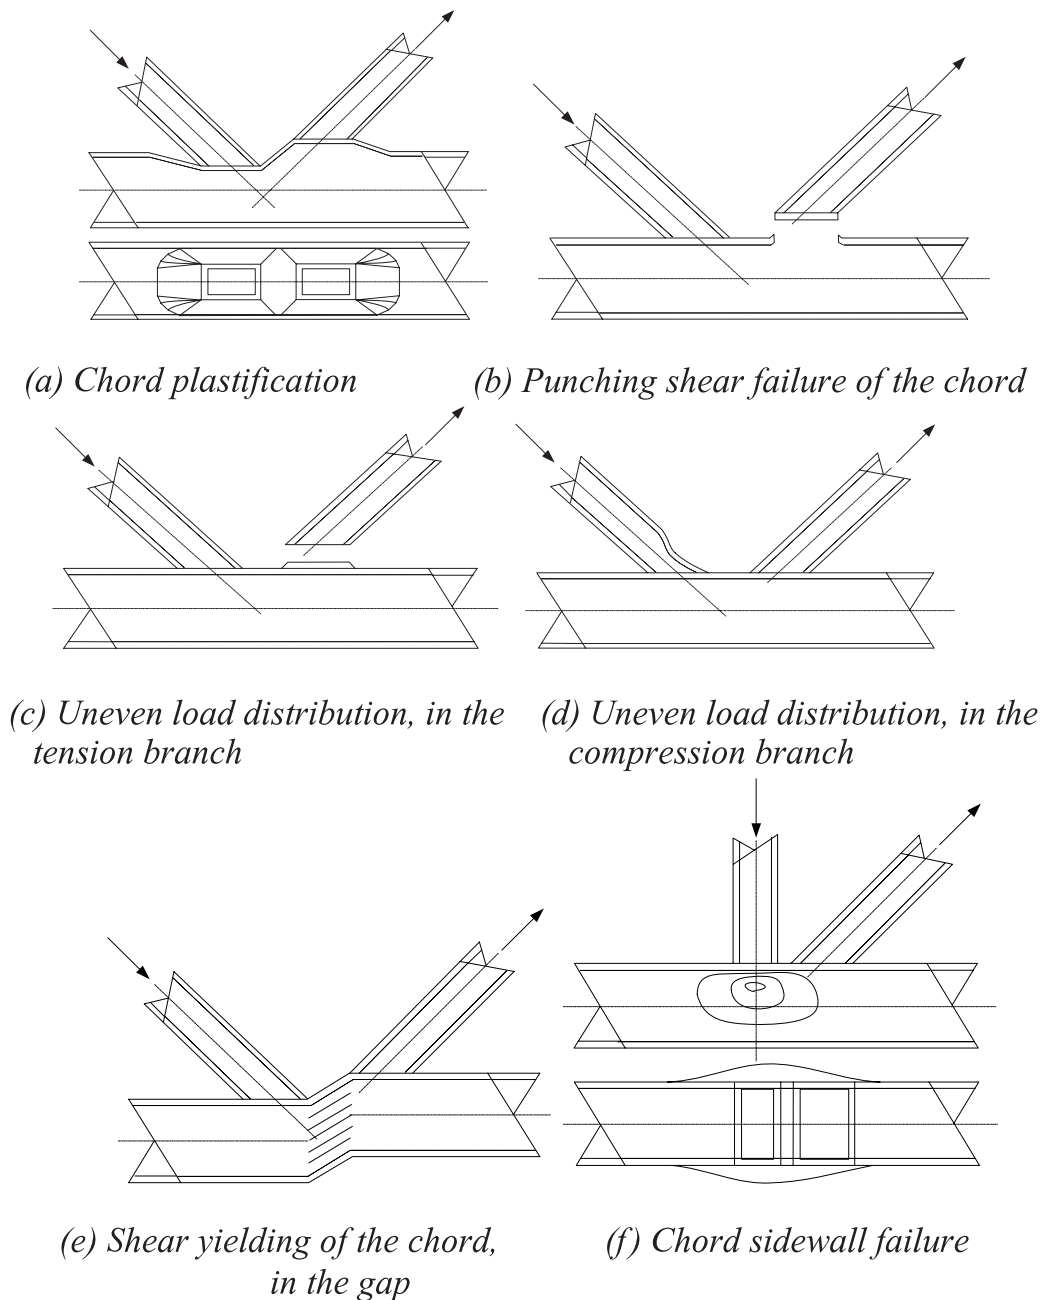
Typical limit states for HSS-to-HSS truss connections.
